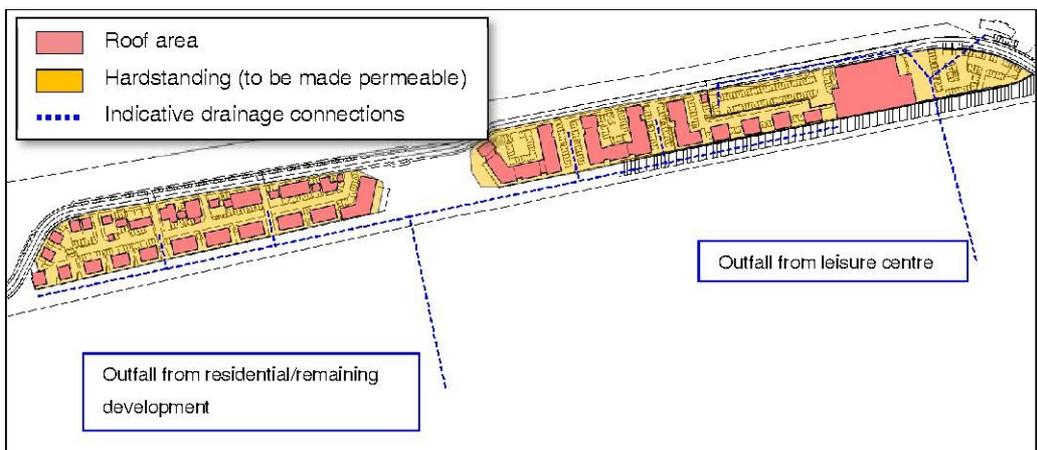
Indicative drainage layout plan showing the possible location of both new outfall structures.
